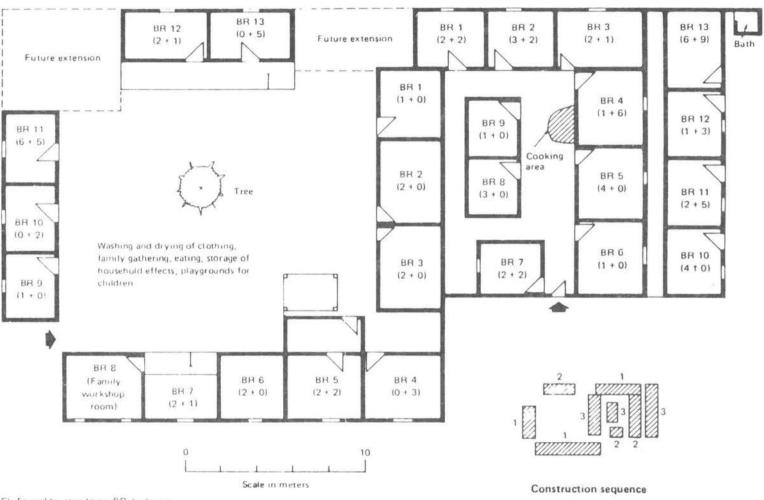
Typical Floor Plan of Low-income Rental Units
